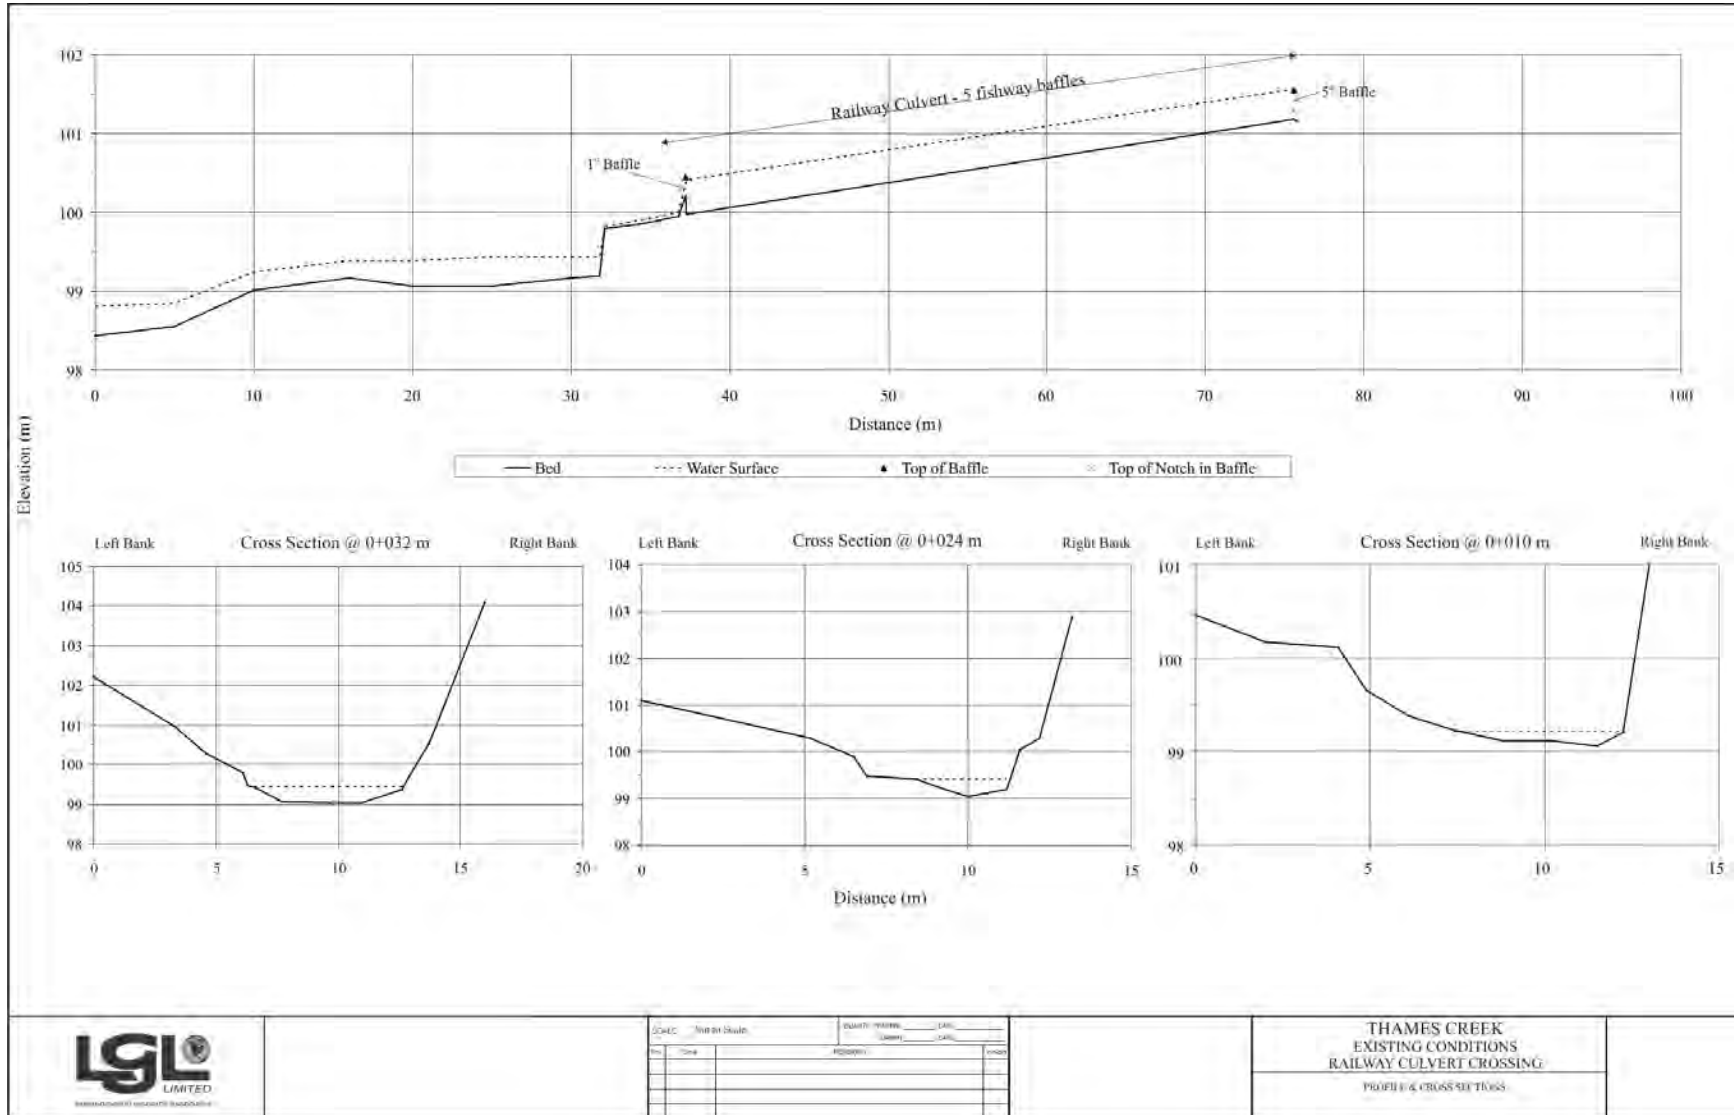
Existing profile and cross sections of Thames Creek at Southern Railway culvert crossing.
